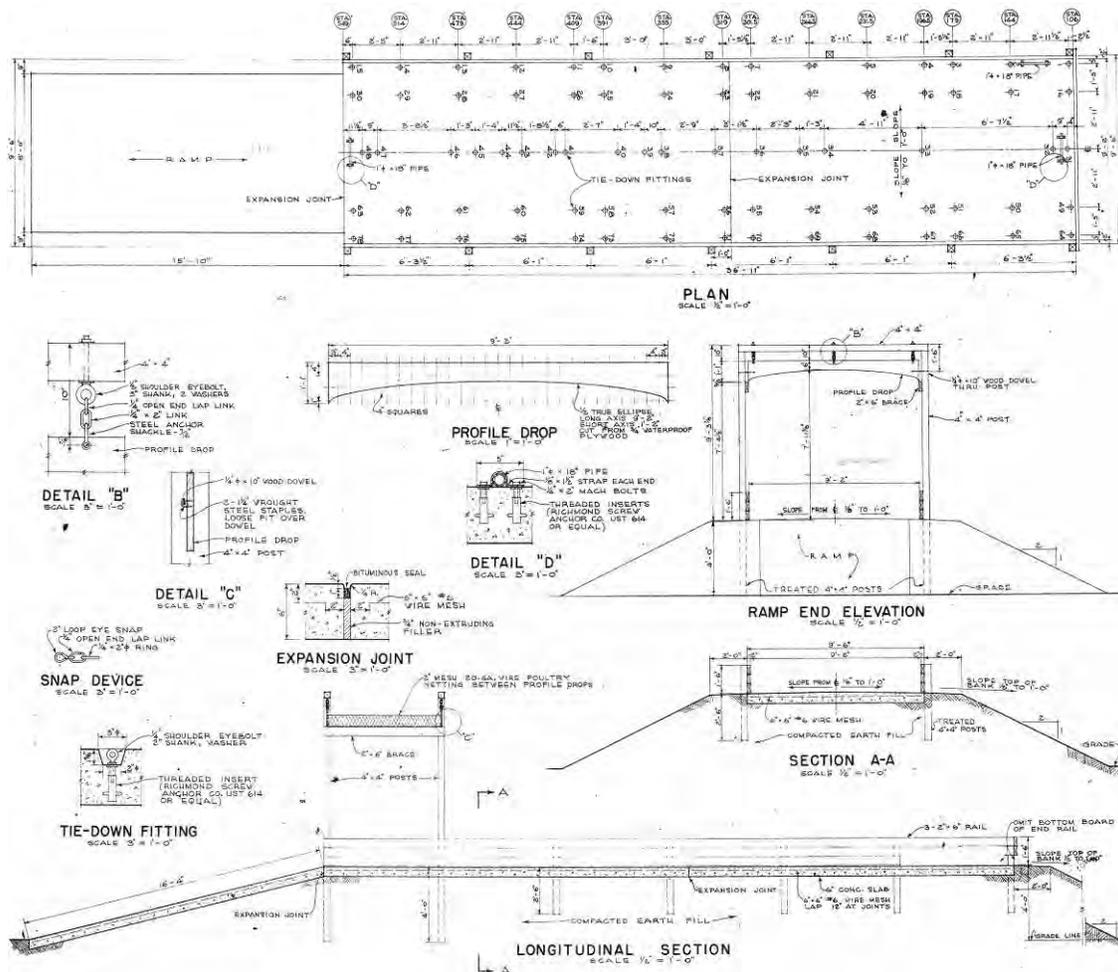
C-119 mock-up for air movement training, frame construction, framing plan, Fort Bragg, NC, 1951 (standard drawing 28-13-53 sheet 1 of 1; C-119 mock-up for air movement training, frame construction, plans, and details; 7 December 1951).
